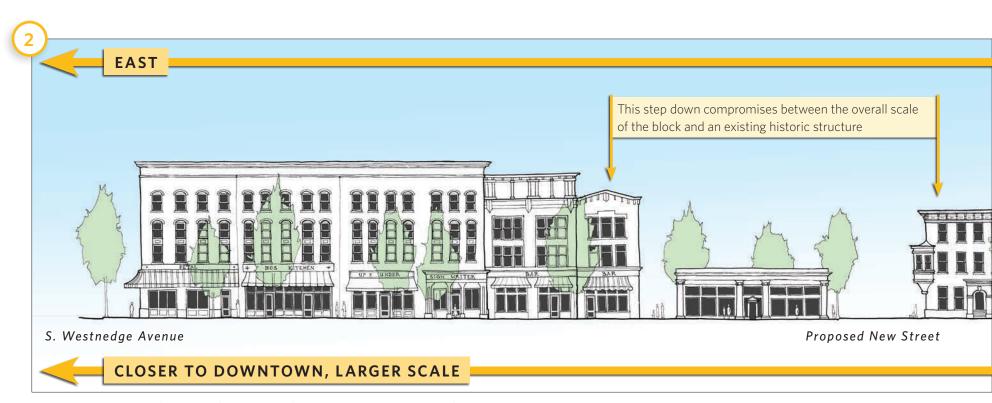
Street Elevation along W. Michigan Avenue, Facing South
